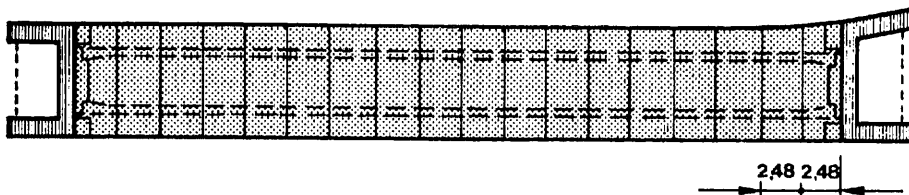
Single-span box-girder bridge in Vienna, Austria
